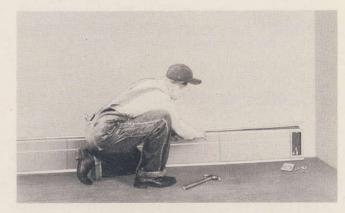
A strip of quarter round molding fastened on top of baseboard covers the seal.
